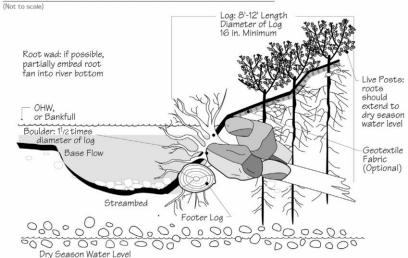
Cross section of embankment showing root wads and boulders with live planting. USEPA 2007.
